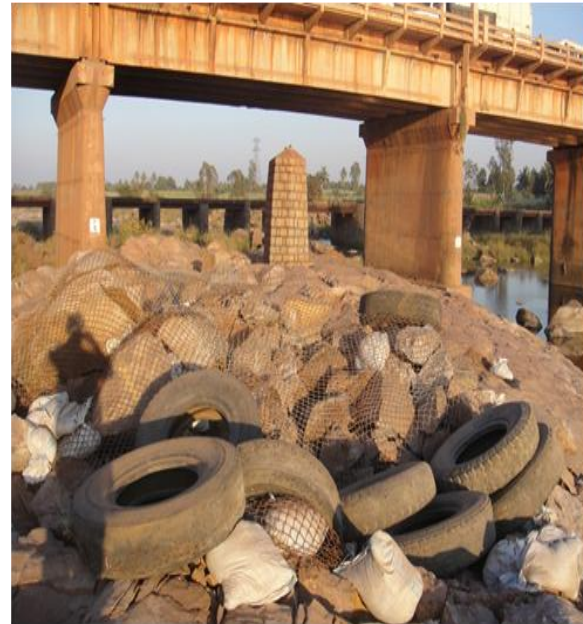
Post blast view of the muffled blast adjacent to the bridge
